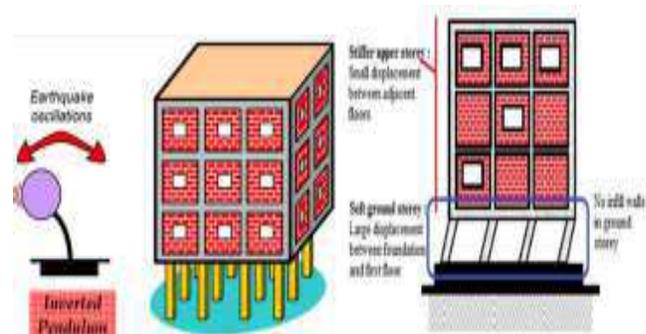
Open ground storey building behavior. (IITK, Earthquake Tip)
